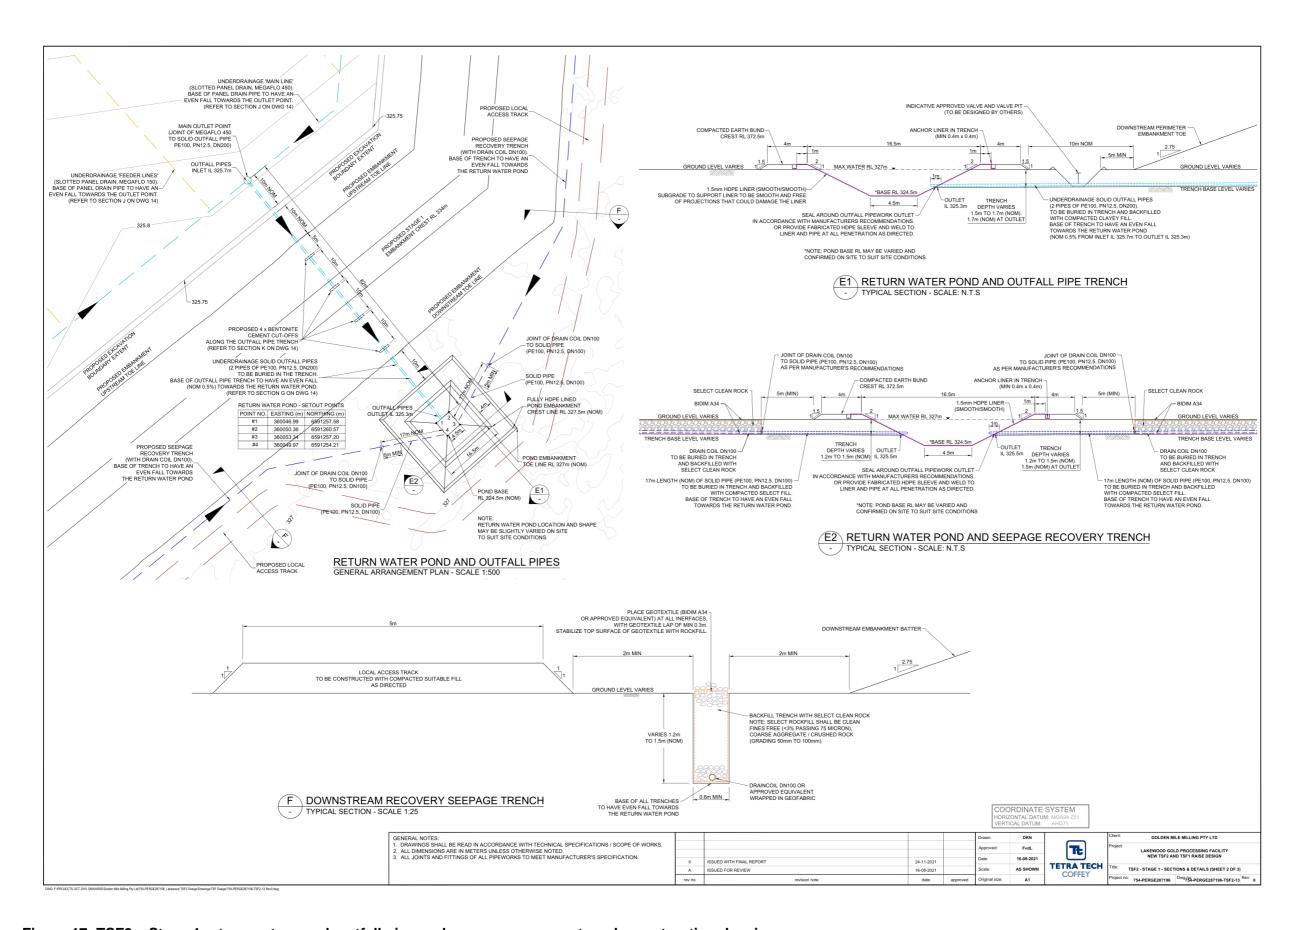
TSF2 – Stage 1 return water pond, outfall pipe and seepage recovery trench construction drawings
